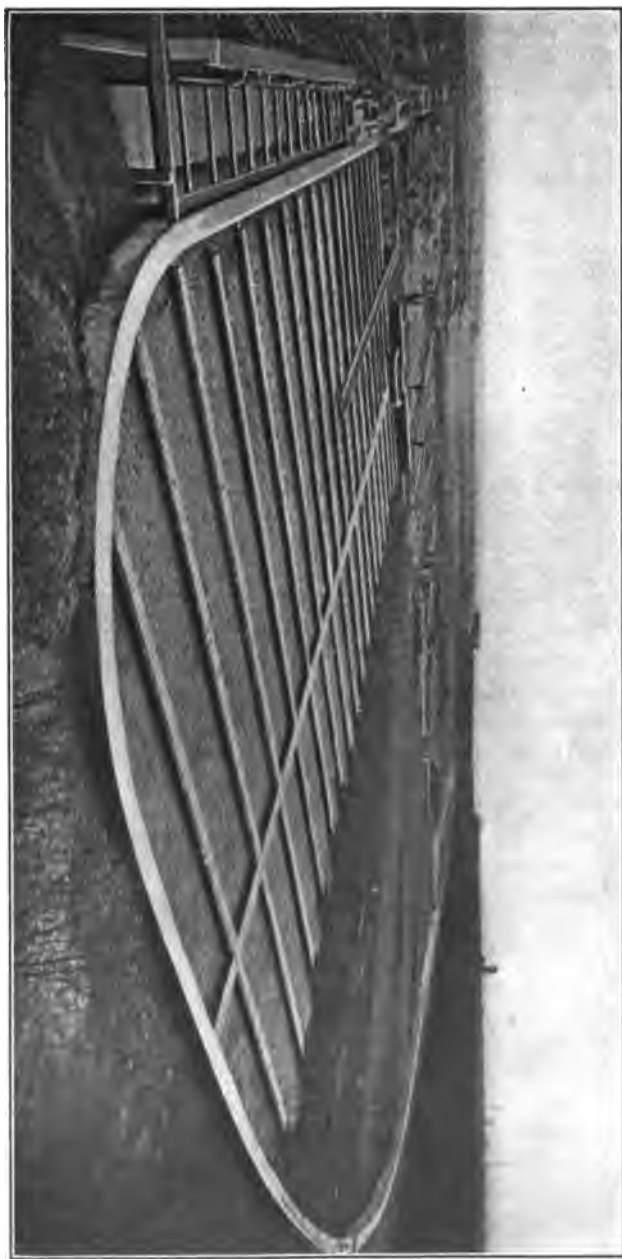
Underdrains and filling of a partly constructed storm-water bed, Manchester, England.
